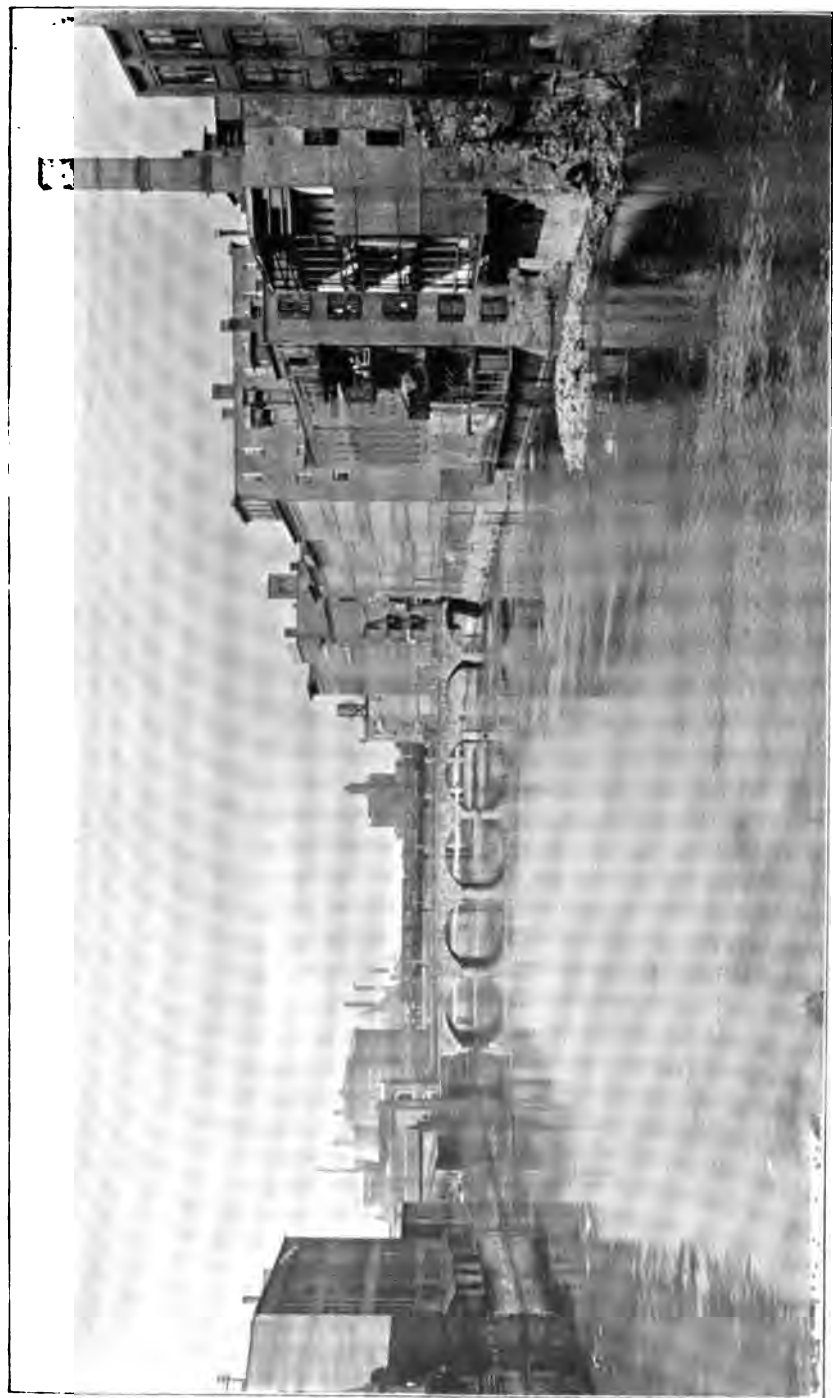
Plate XVI. THE PRESENT ANDREWS STREET BRIDGE IN THE CITY OF ROCHESTER AND THE GENESSEE RIVER TO THE SOUTH OF THAT BRIDGE
